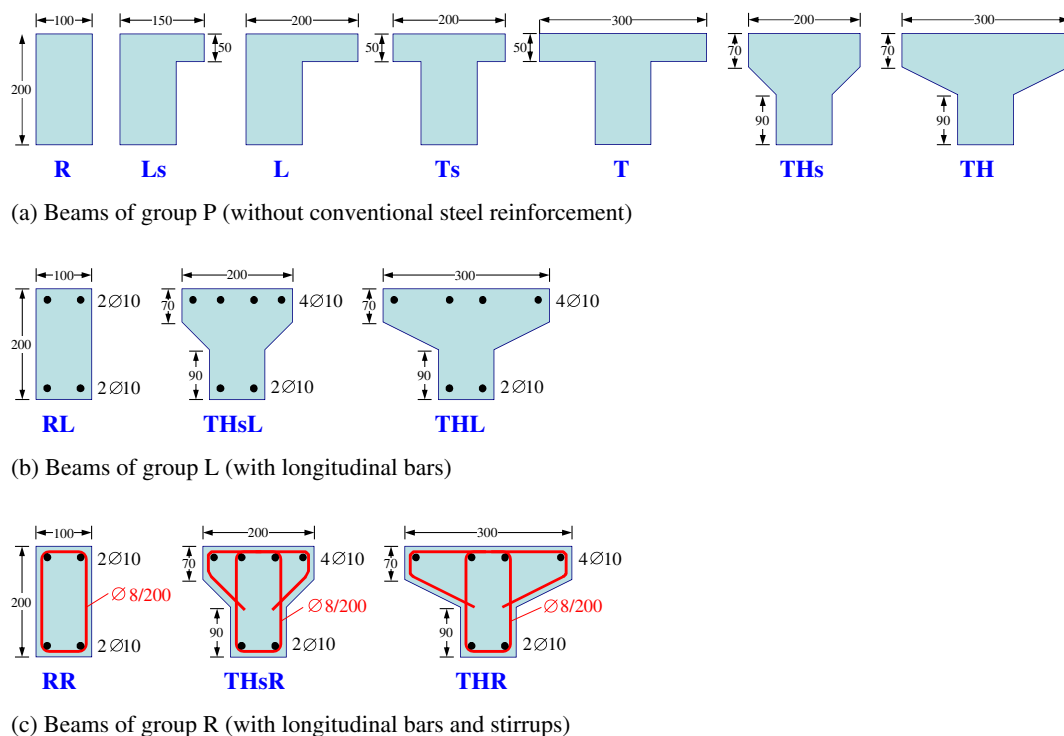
Cross-sectional dimensions and conventional steel reinforcement of the tested beams.
